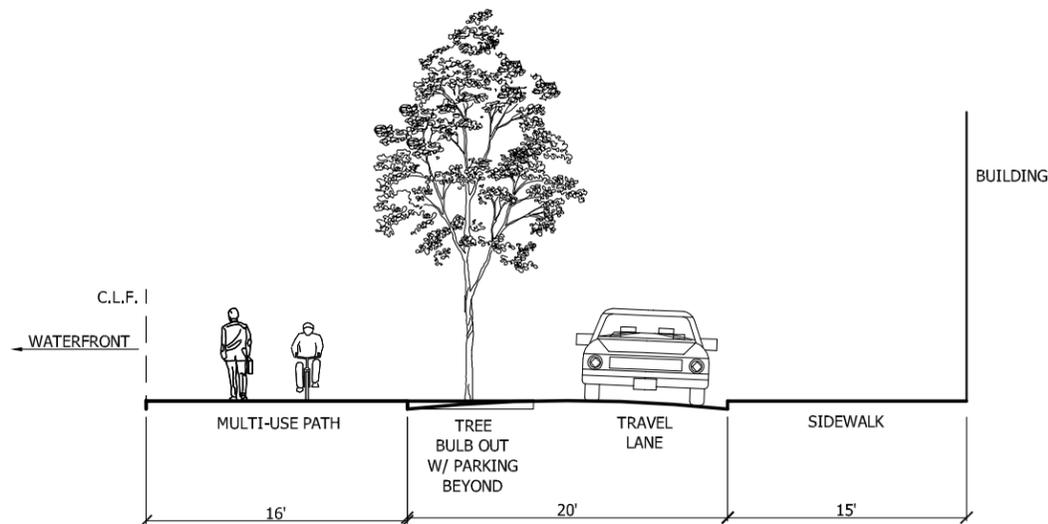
Possible configuration for Halleck Street between Court Street and Smith Street
